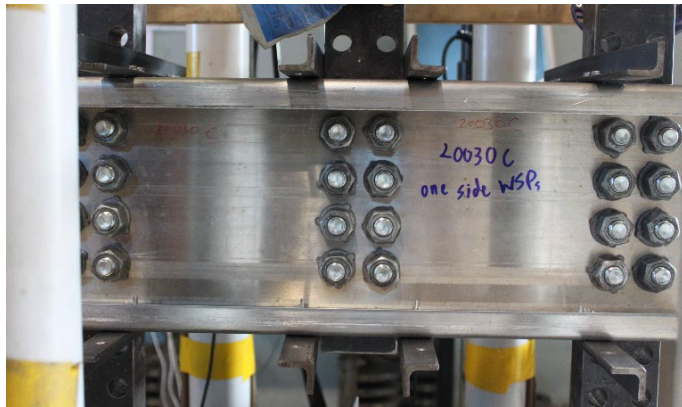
Shear test assembly of 20030-1WSP-8AS-2VRB.
